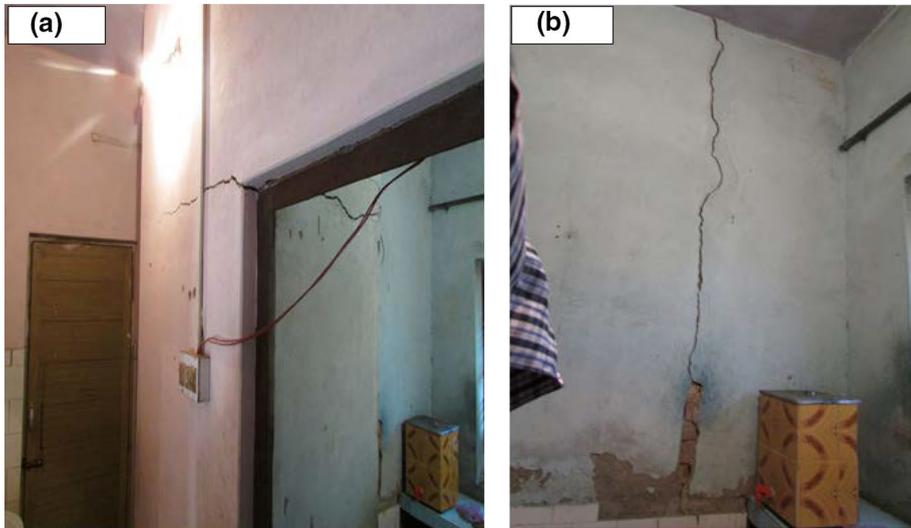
a, b Damages suffered by a two-storied load-bearing masonry building
